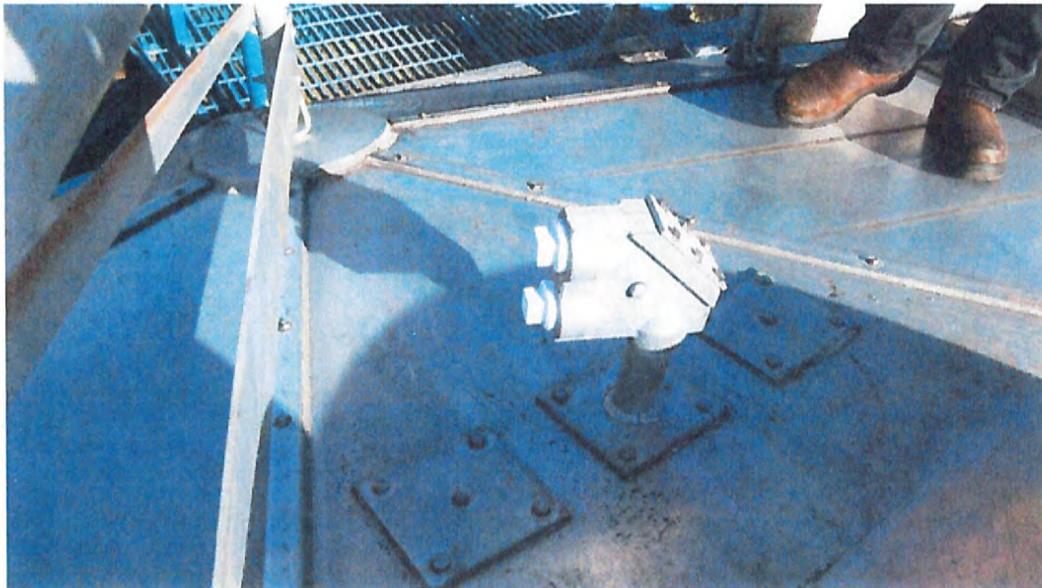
Red Hill Tank – Water level assembly completely removed and plugged.
